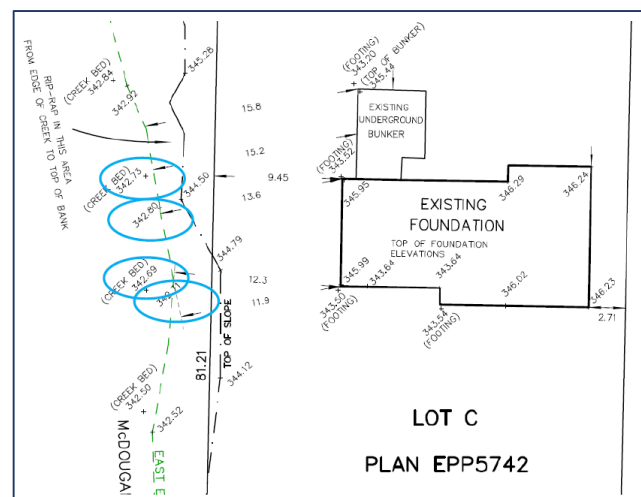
Existing Foundation Setback from McDougall Creek and Elevations
